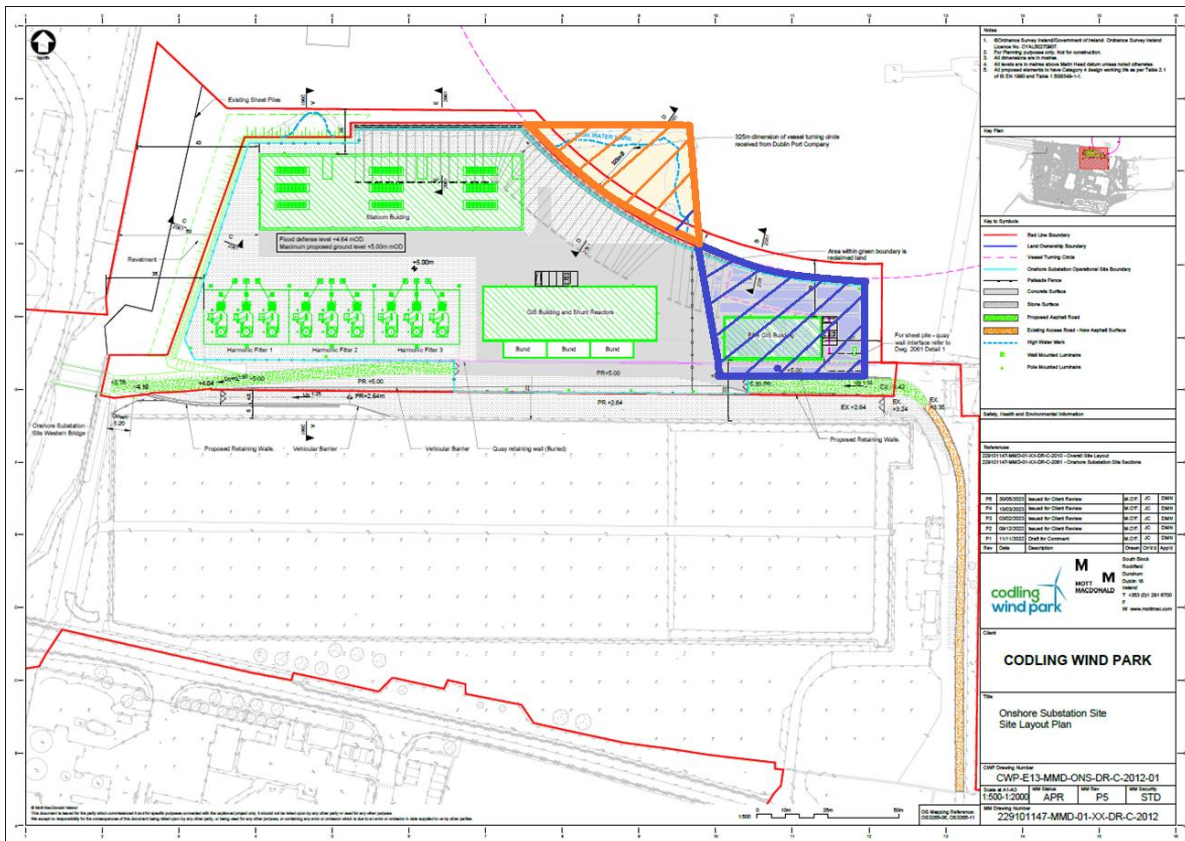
Codling Wind Park onshore sub-station site layout plan. Reclamation area hatched blue and demolition/dredge area hatched orange.
